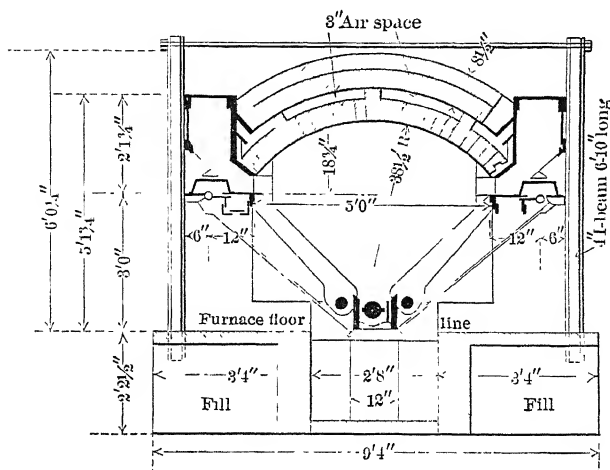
VERTICAL CROSS-SECTION THROUGH THE FIRE-BOX OF THE FURNACE, AND THE MURPHY STOKER.
